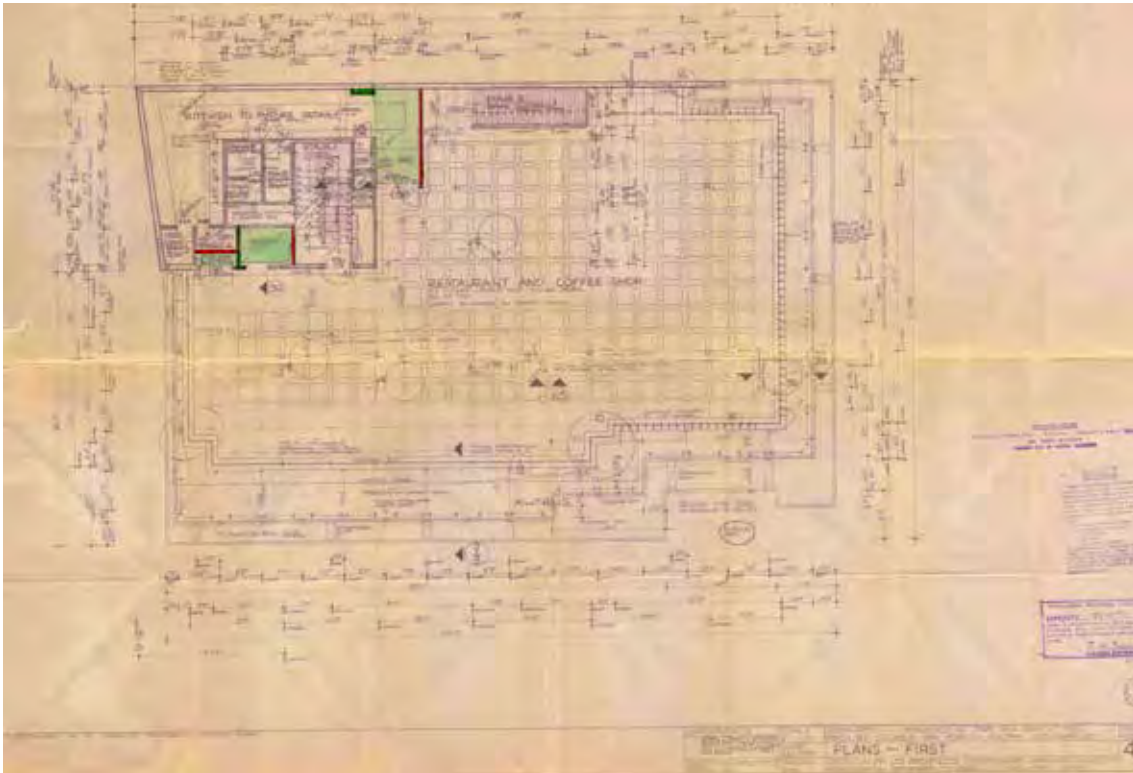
| First floor plan of the Gruzman design. The service areas have been extensively altered since and the coffered ceilings were never constructed. (Source: BA file BA 1546/1971)
